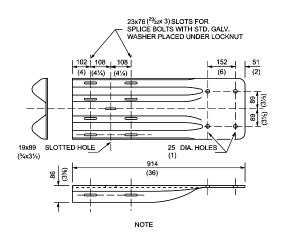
PLATE A SHALL BE PLACED BETWEEN RAIL ELEMENT AND BLOCK-OUT AT NON-SPLICE MOUNTING POINTS ONLY WHEN STEEL BLOCK-OUTS ARE USED.
